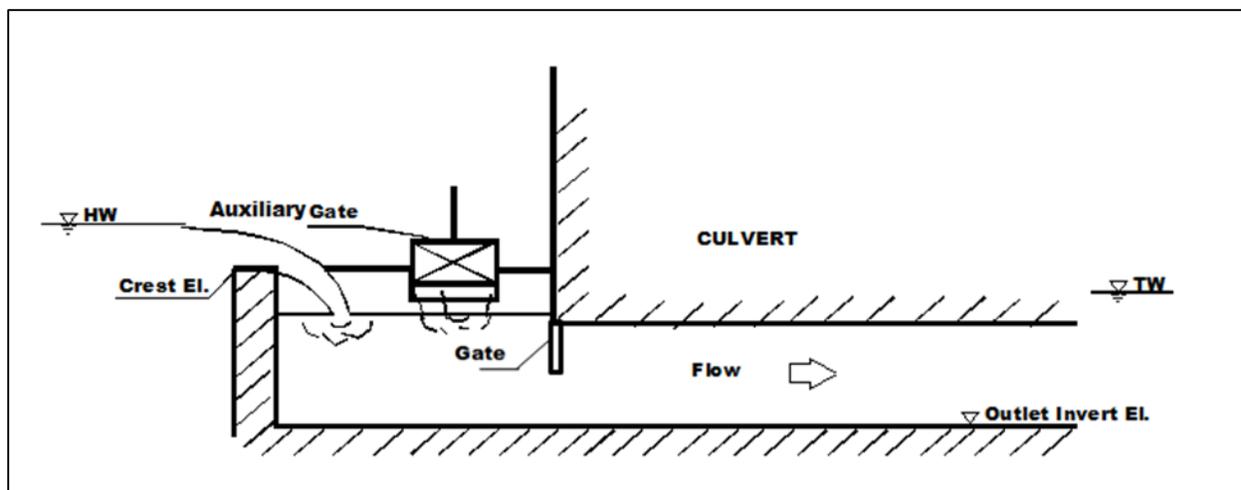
A weir-box culvert with a sluice gate on its sidewall, followed by a gated culvert
